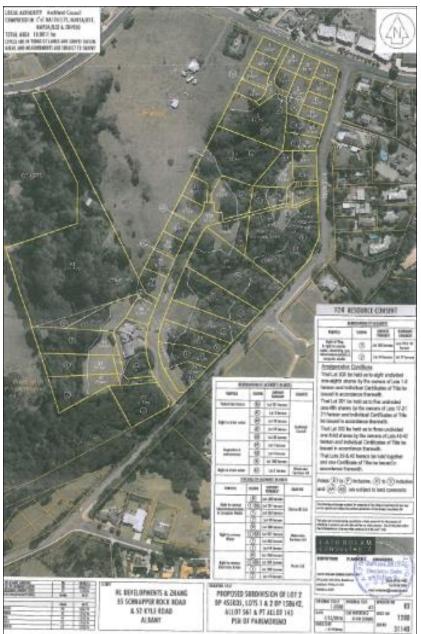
Approved Scheme Plan for subdivision of 55 and 89 Schnapper Rock Road and 52 Kyle Road.
